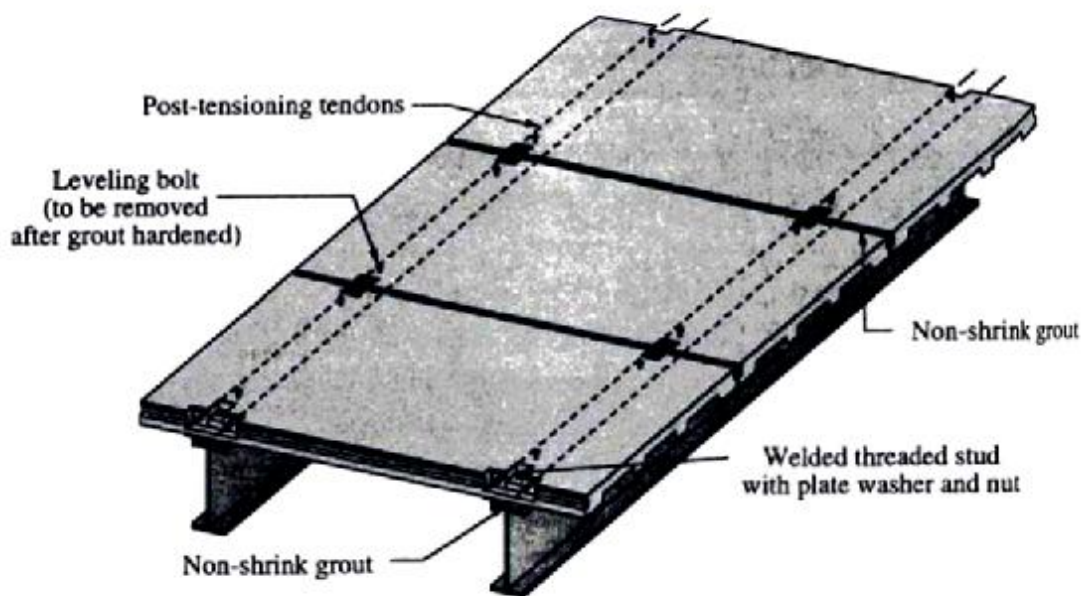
Full-Depth Precast Prestressed Bridge Deck System (Yamane et al., 1998)
